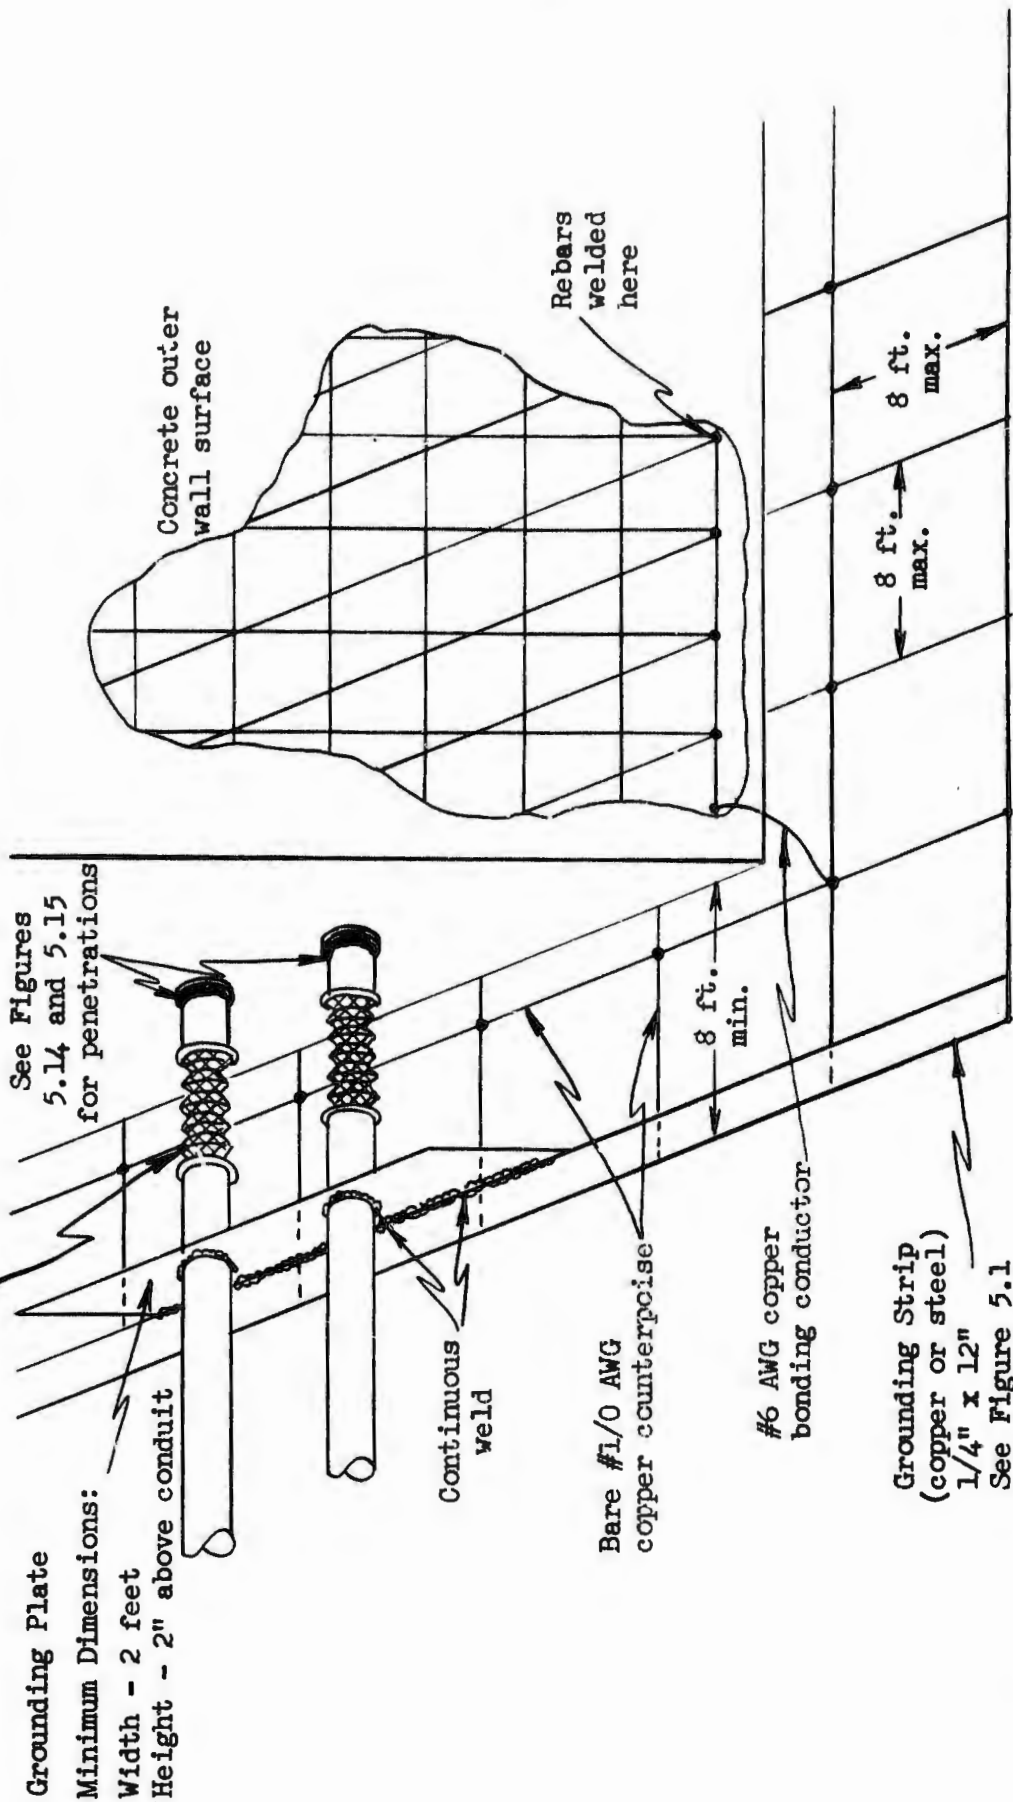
Conduit or Pipe Ground Connections at Counterpoise for Penetrations of an Outside Unshielded Wall or Wall Shielded with Rebars or Welded Wire Fabric Shielding at Counterpoise Elevation. Does not apply to Overall Metal Shielded Buildings.
